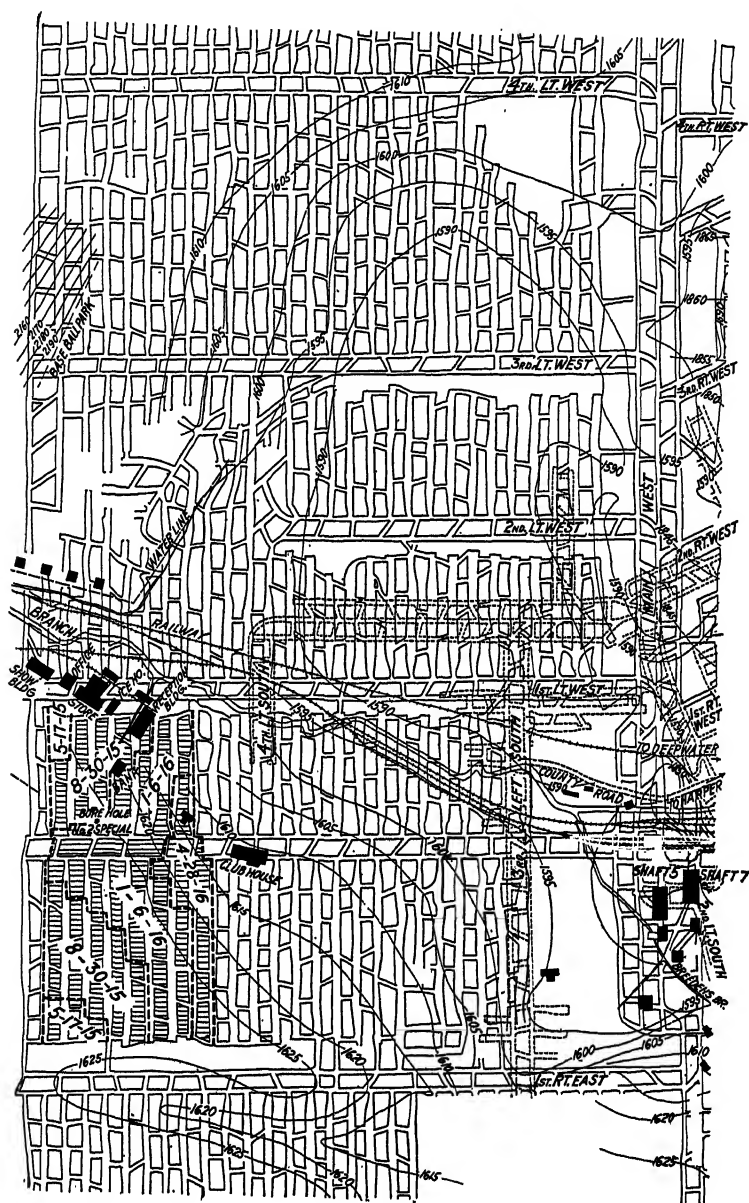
LOCATION OF SURFACE CRACKS AND
